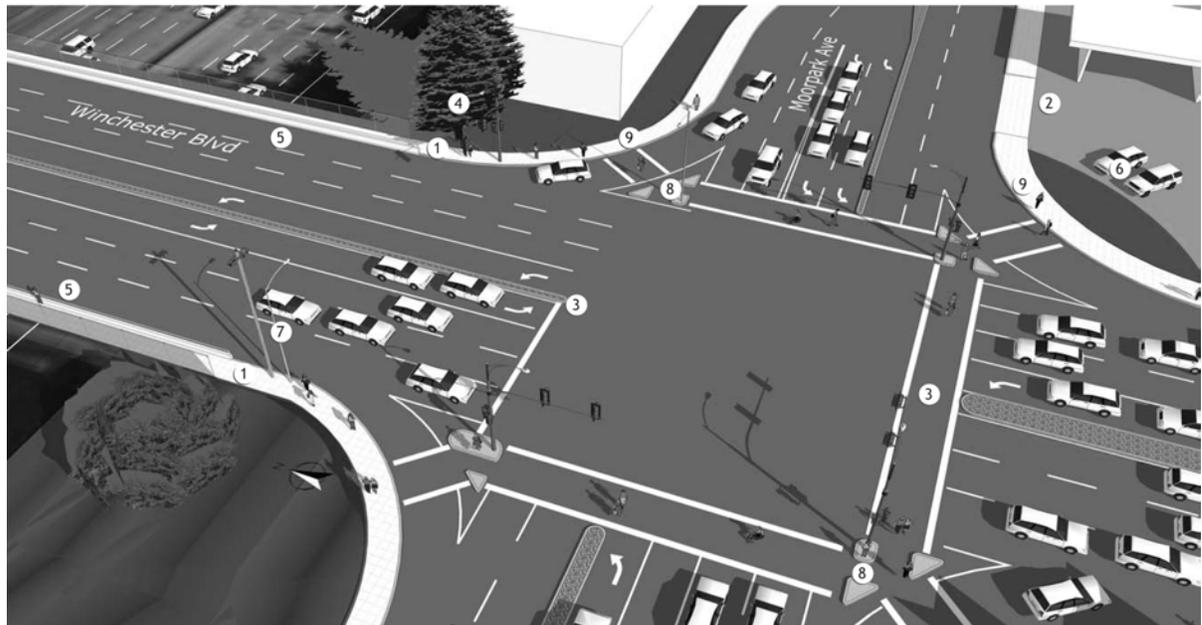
WINCHESTER BOULEVARD/I-280 BRIDGE - EXISTING
